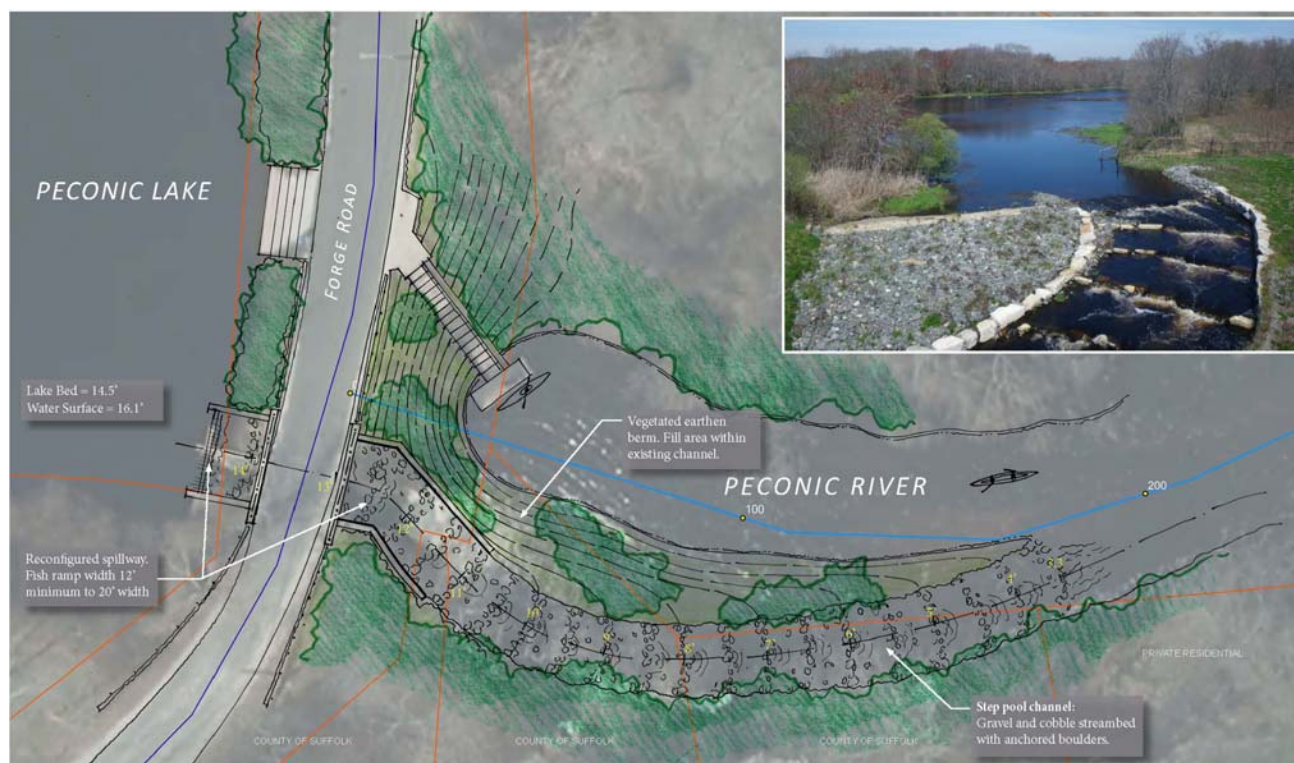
Concept Plan - Fish Ramp / Natural Fishway
